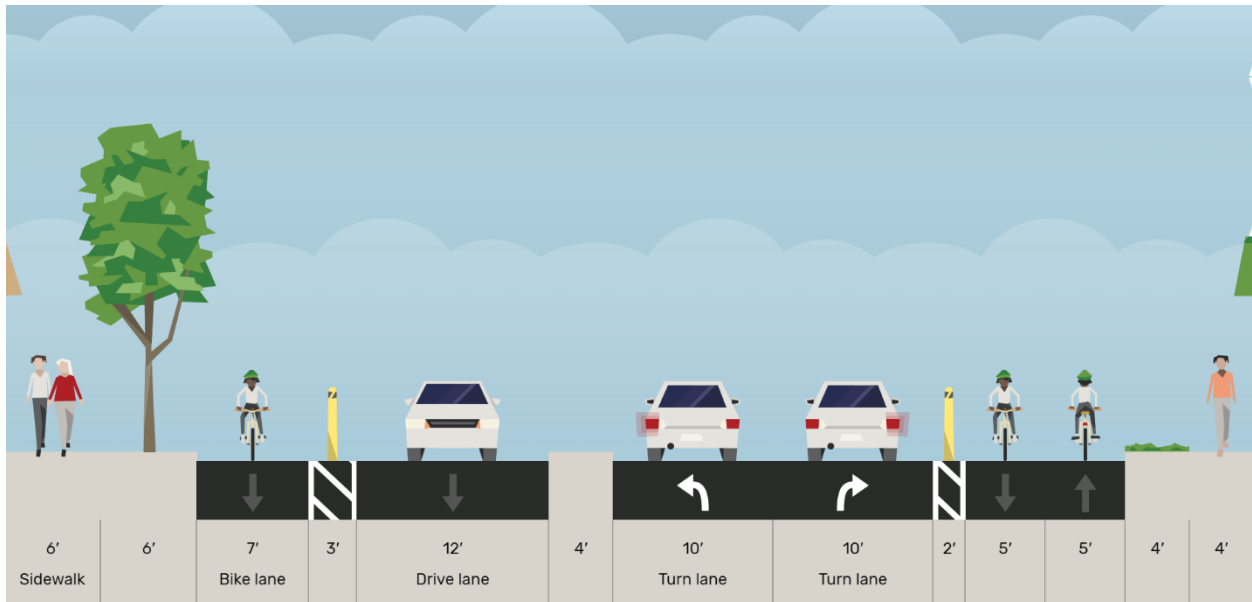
HOLLAND LANE CORRIDOR ALTERNATIVE 3 CROSS-SECTION FROM JAMIESON AVENUE TO DUKE STREET
